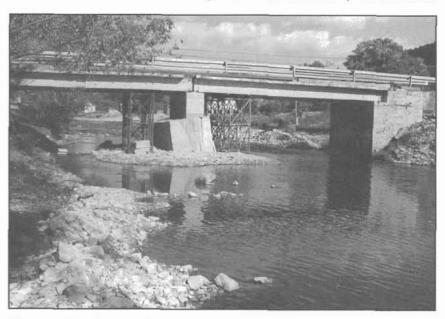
Lifted spans after the bridge broke due to undermining of its pillar. Note the significant settlement (approximately 1 meter) of the pillar and its dislocation (Radochów town - Baila Ladecka River).
